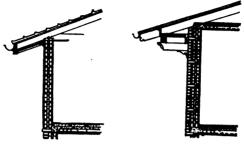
Pitch Roof with Box Cornice, the Wall Being Hollow Tile Stucco-Coated
